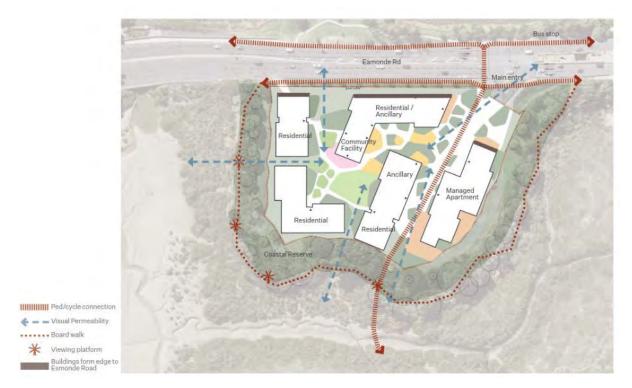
Proposed masterplan for site (source: Jasmax - Esmonde Road proposed planning approach)
